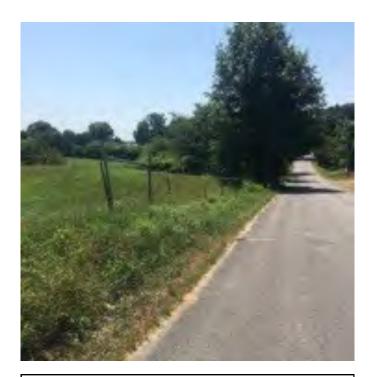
Facing north — view of CR 33 south of U.S. 20.
